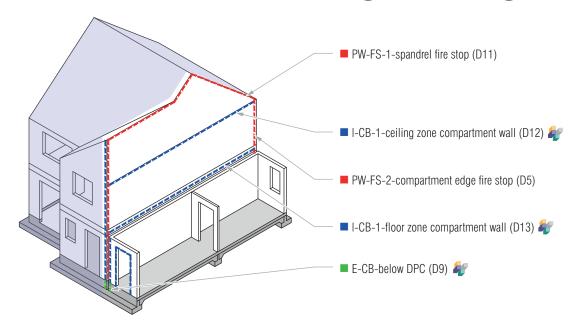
Internal frame compartment wall between dwellings that includes a cavity; single dwelling structure with uninhabited pitch roof space²
